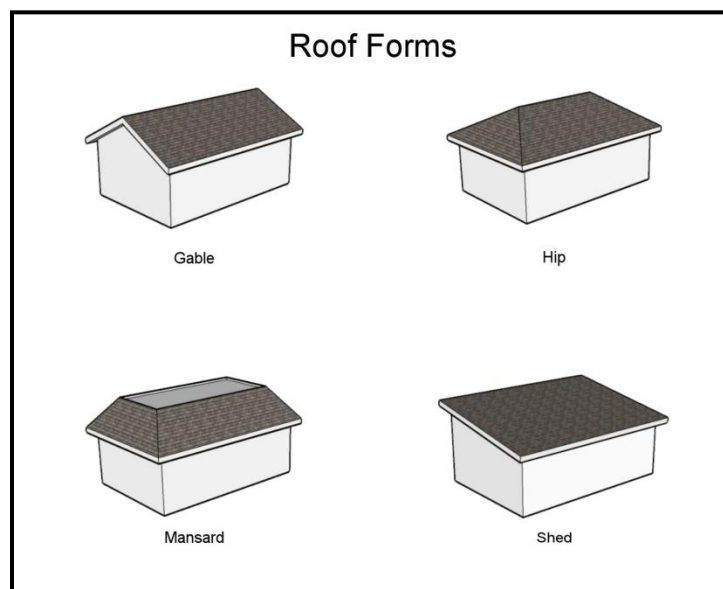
E. EXAMPLES OF PERMITTED ROOF FORMS.
